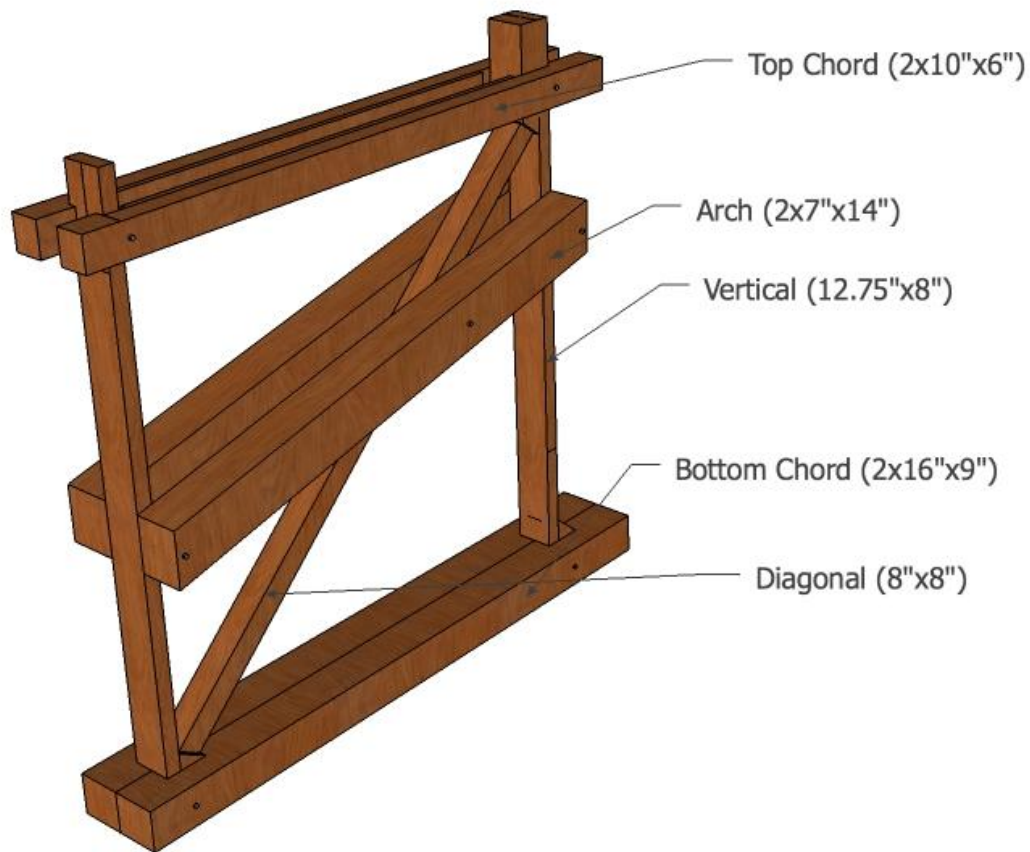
Beverly Bridge Typical Truss Panel Near Center of Span
